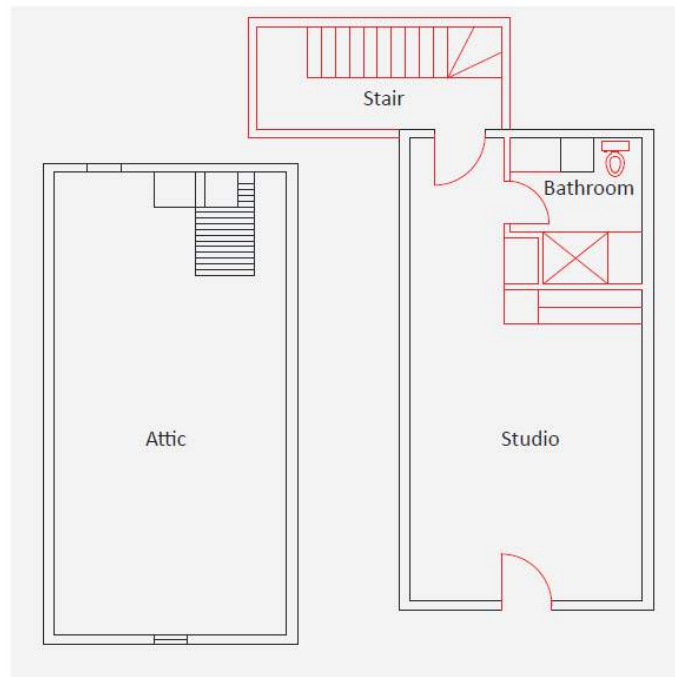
Existing and Renovation Plans 1214 N 12th St, Superior WI.
